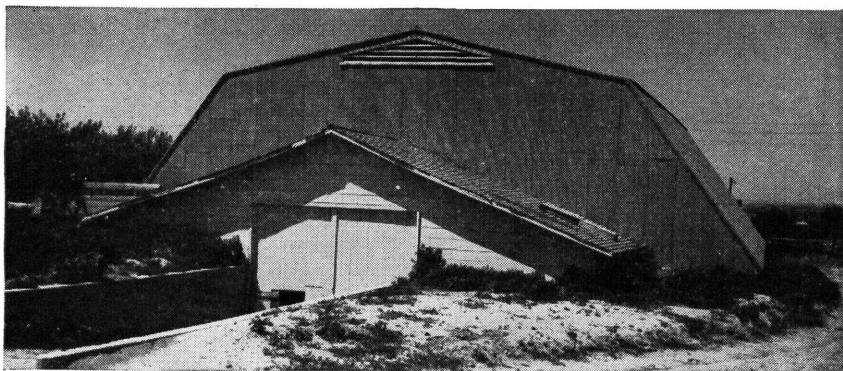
Deep-bin farm storage with a lower drive — upper drive at opposite end — built on a level site.
